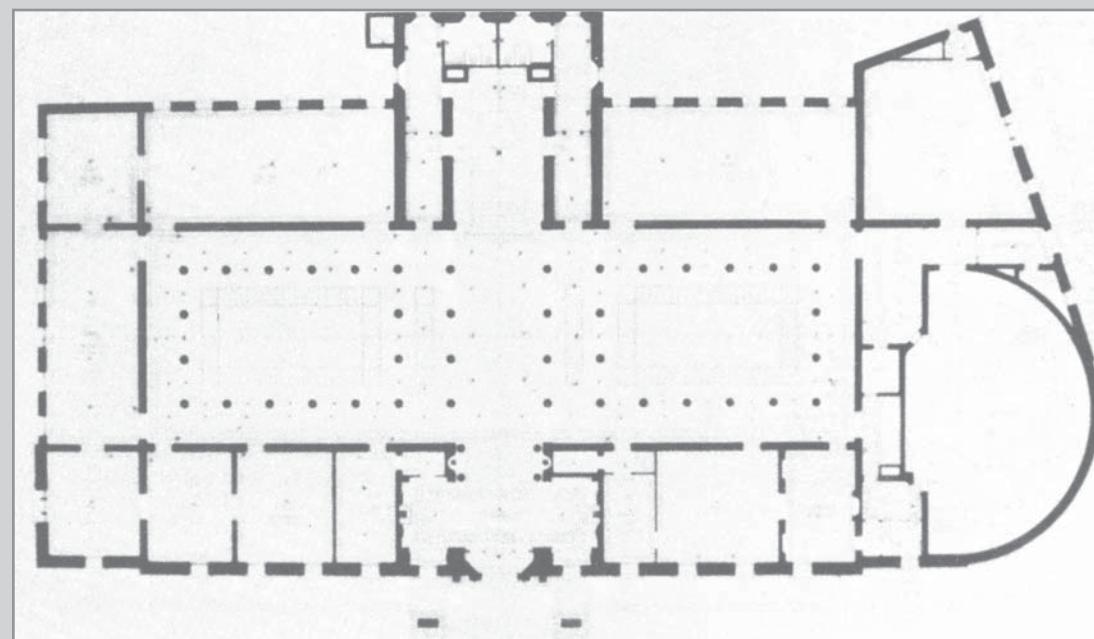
Plan of first floor, Corcoran Gallery of Art. Searling, Helen, *New American Art Museums*, 1982, 37.
